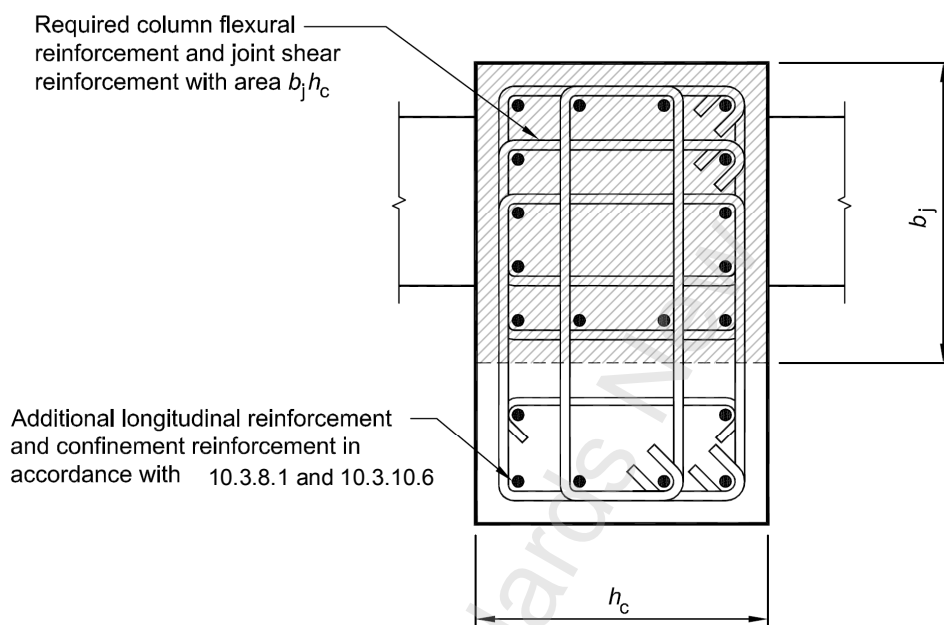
Reinforcing details for joints with wide columns and narrow beams
